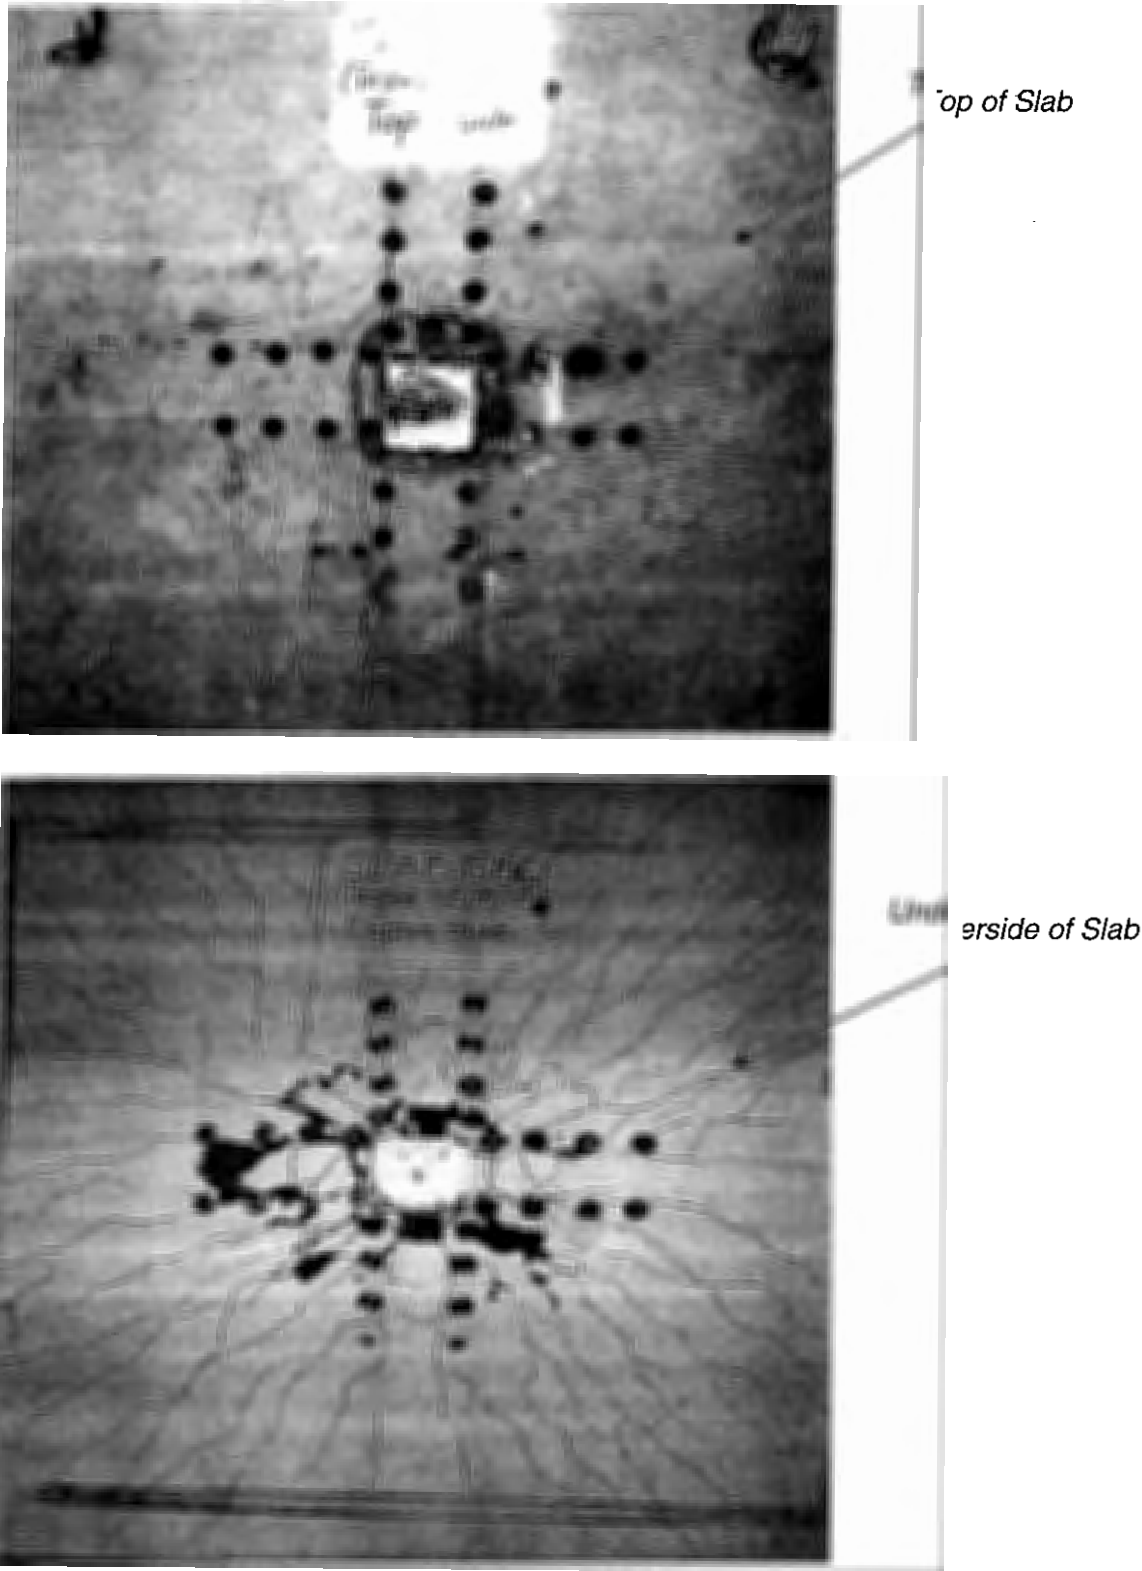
Crack Pattern after Failure of Specimen SB6
